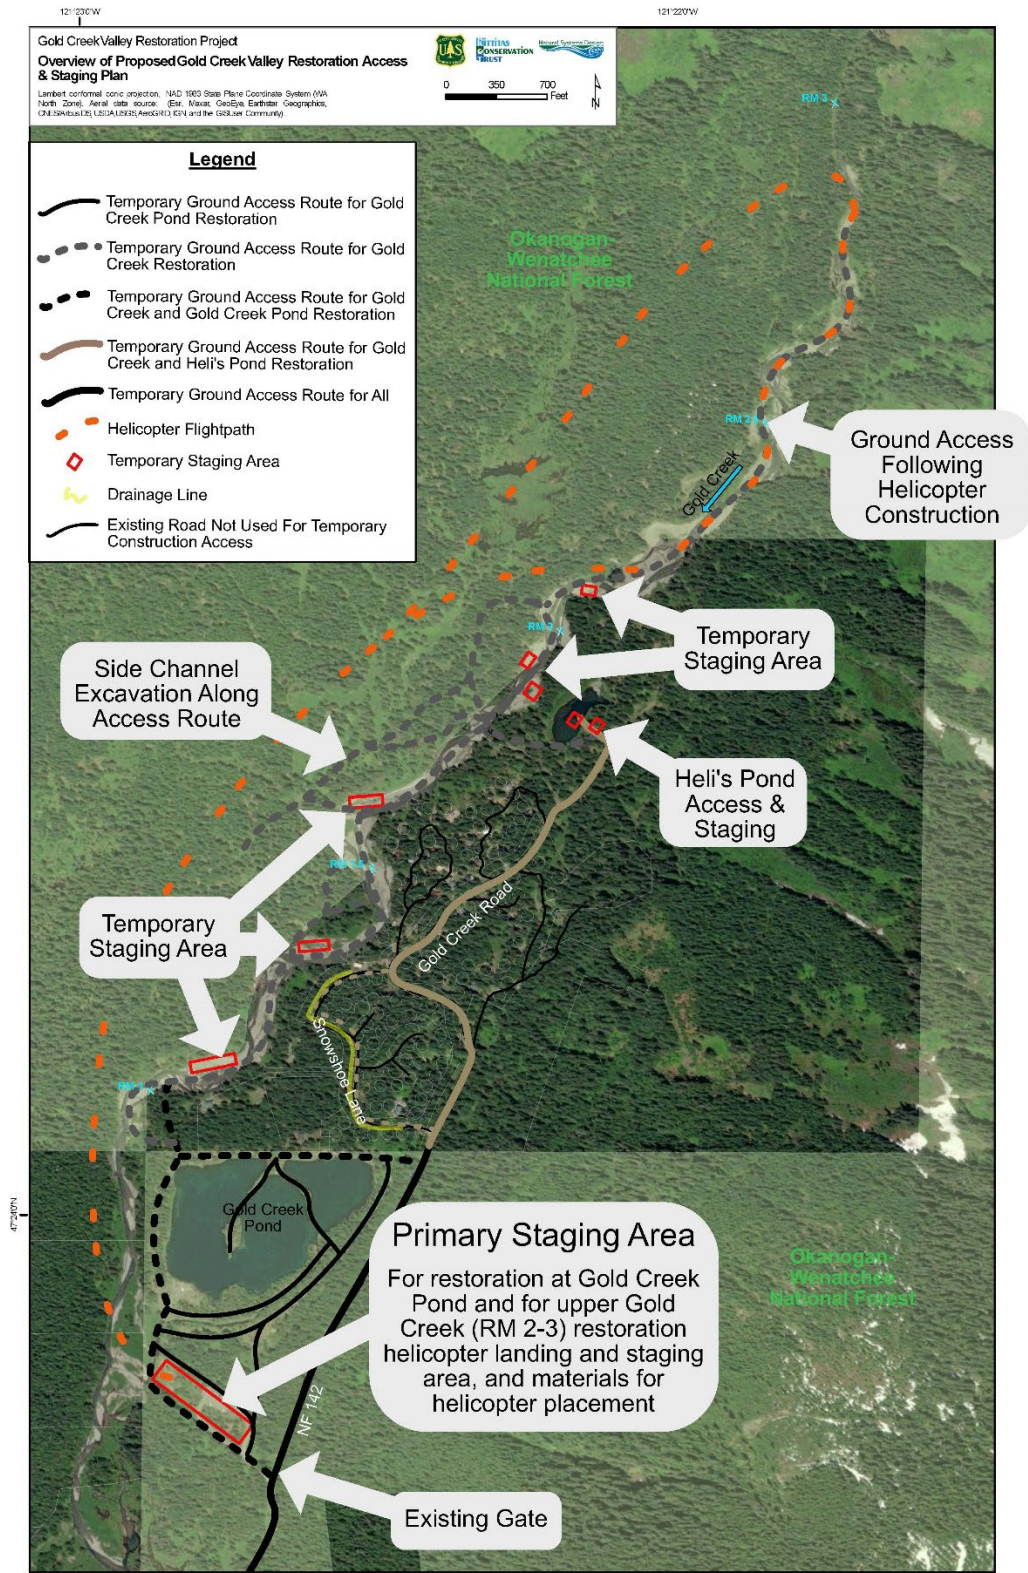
Overview of Proposed Gold Creek Valley Restoration Access & Staging Plan. This is a simplified concept depiction of construction activities detailed in the engineered design plans.
